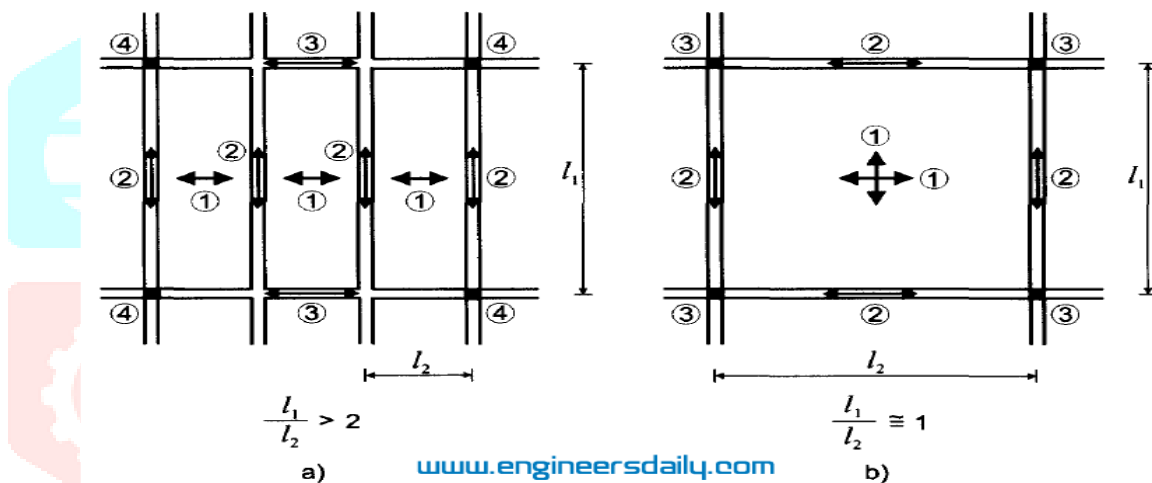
Gravity load path in a floor slab: a) one-way system; b) two-way system.
